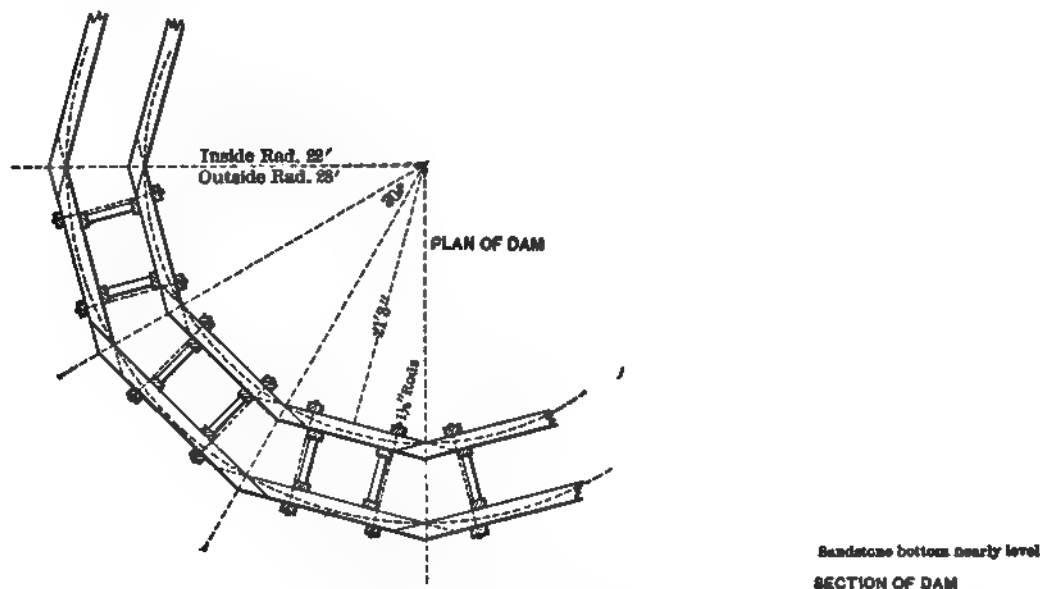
COFFER-DAM FOR ARTHUR KILL BRIDGE.
